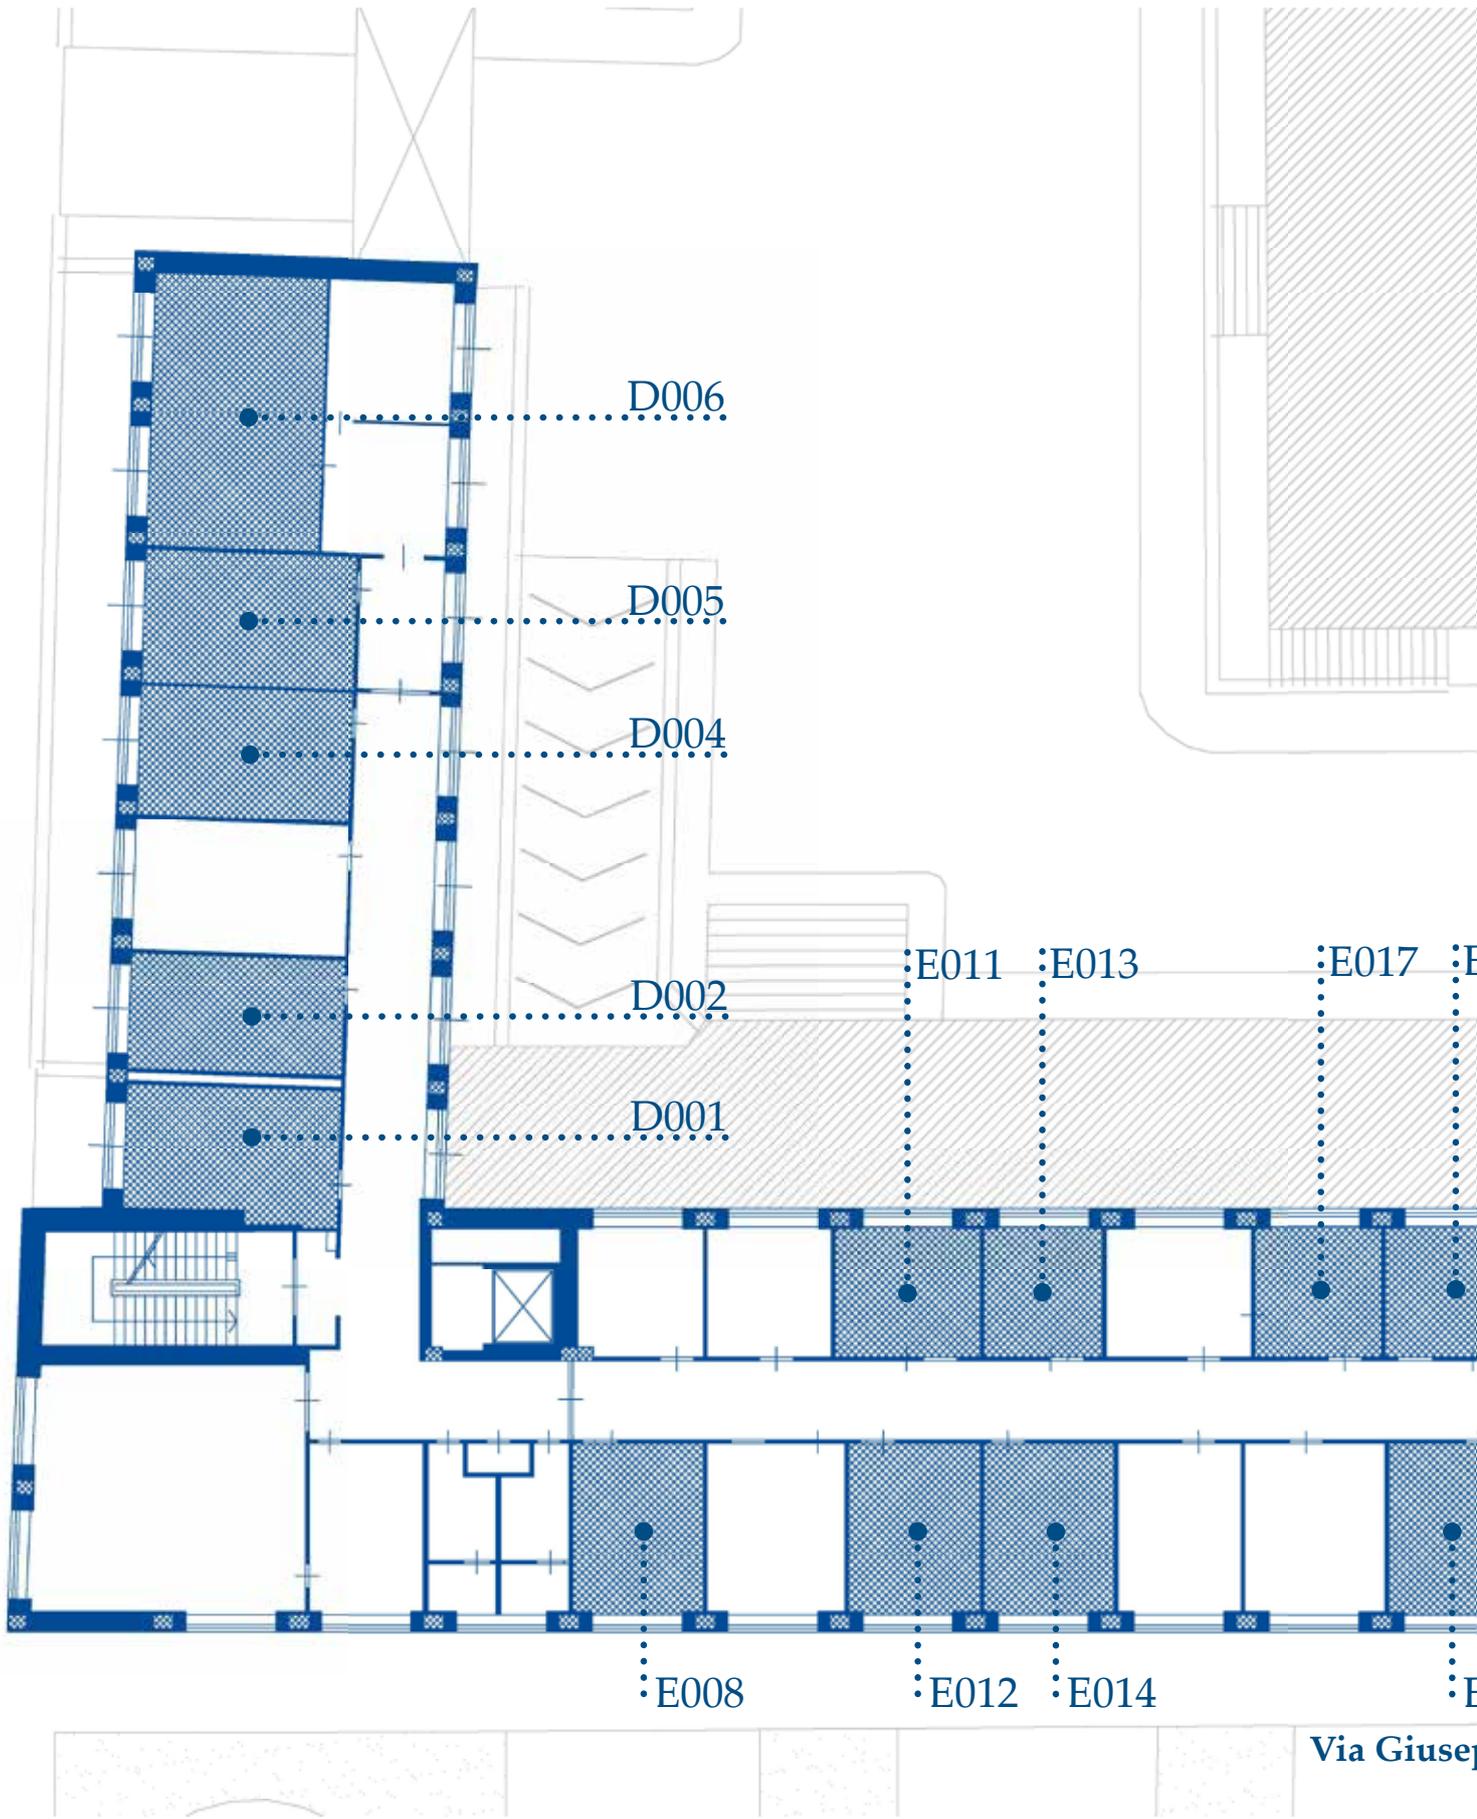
Sketches of offices floor plans from on-site inspection of the south wing of the Polytechnic University of Turin.
